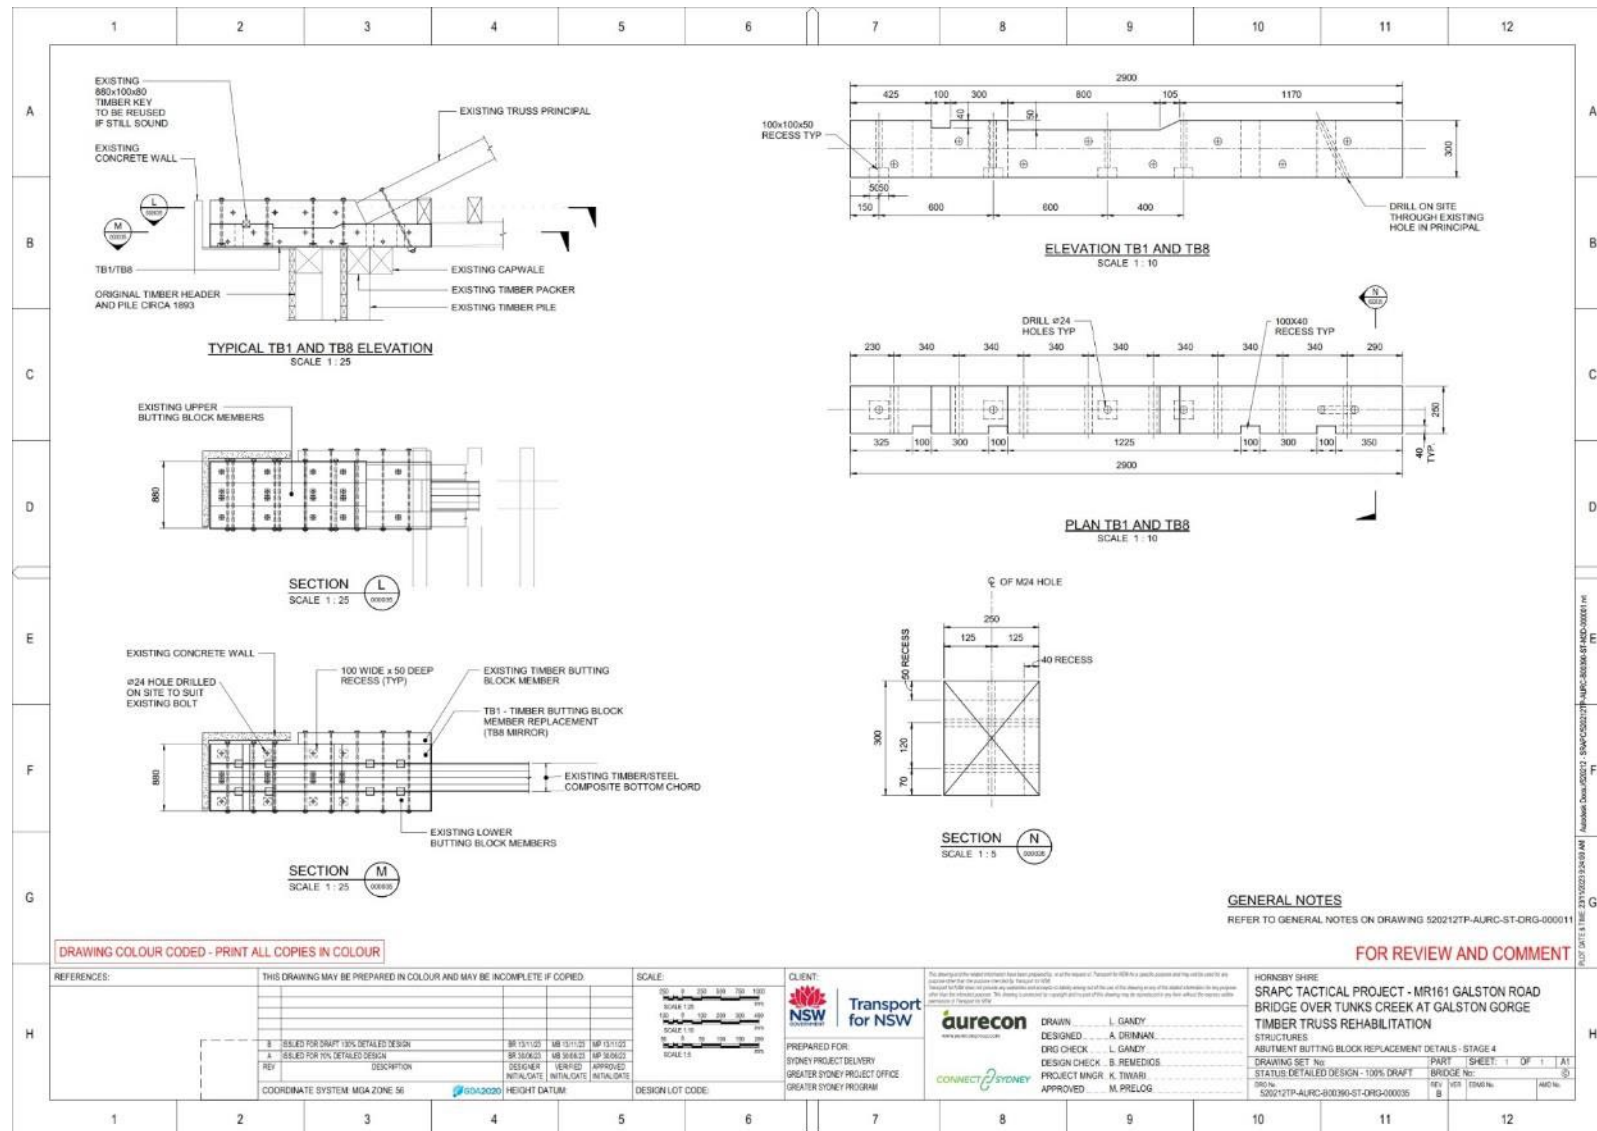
Structures abutment butting block replacement details – Stage 4: 520212TP-AURC-B00390-ST-DRG-000035 (Source: Aurecon)
